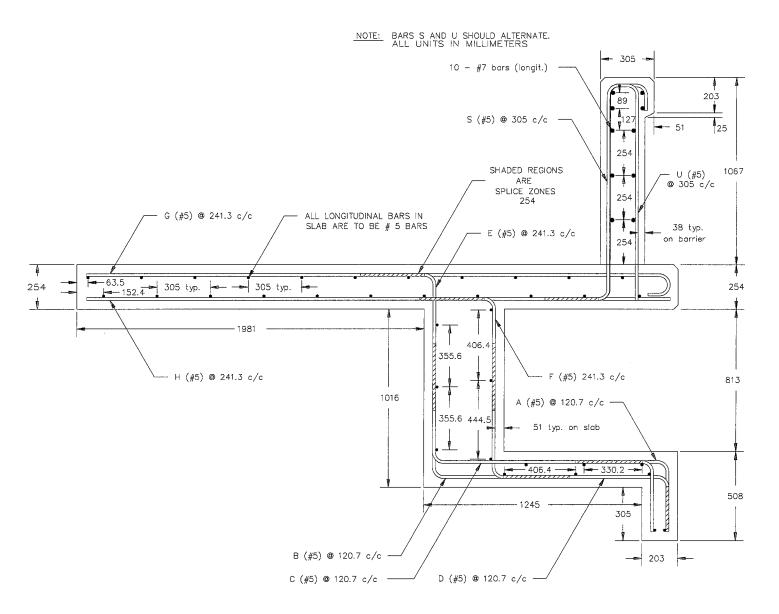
Details of the 1.07-m vertical wall bridge railing installation.
